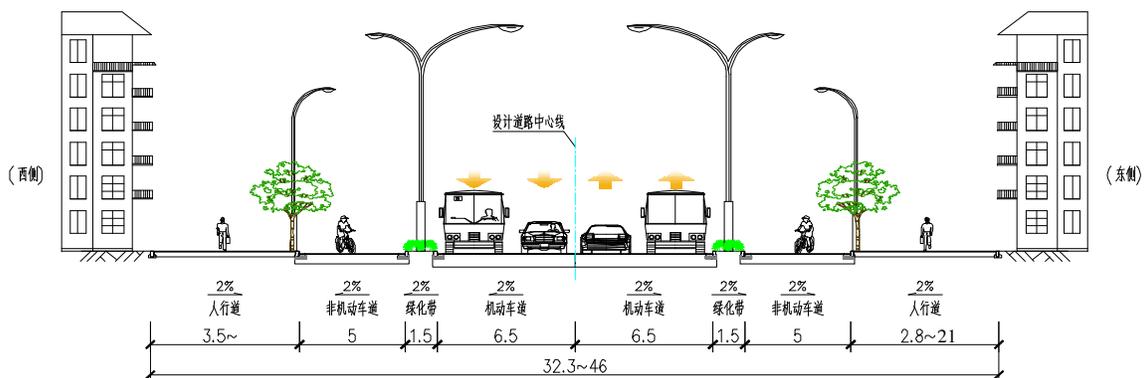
Current profile for Taihang Street □ Fuhou Street
